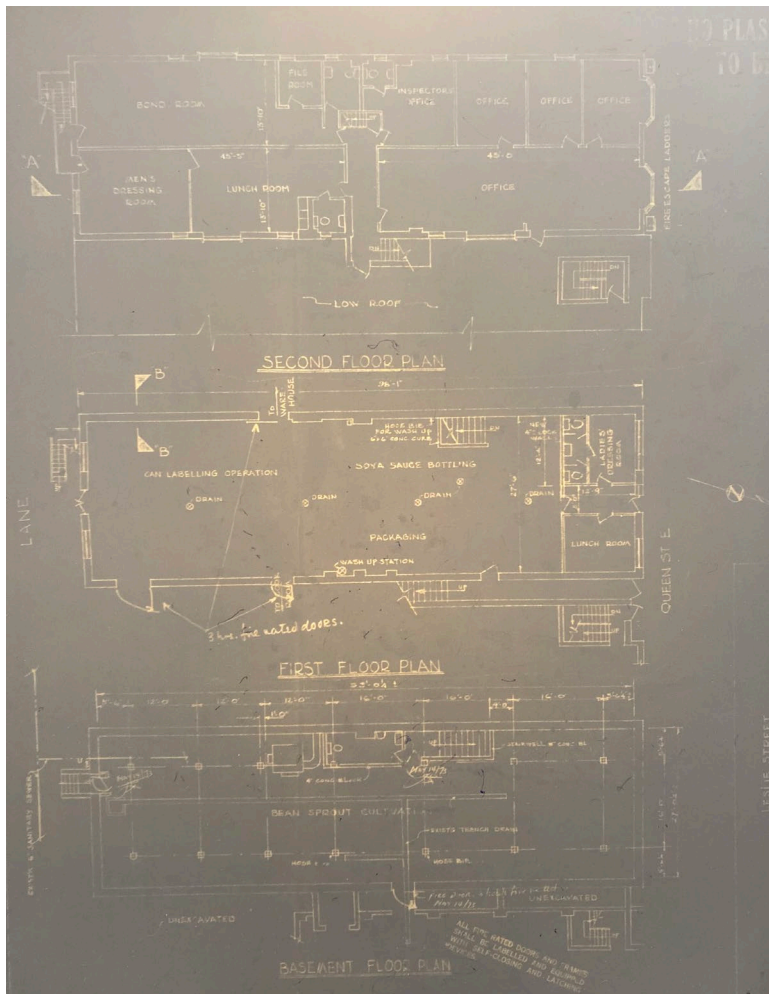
Plans showing the uses of the 1920-1921 building, 1970. (City of Toronto Building Records)
